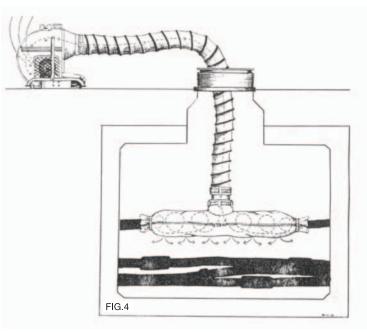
Illustrates a typical Windbag cable-drying operation. Heater/Blower should be placed a minimum of 5' from manhole opening.
